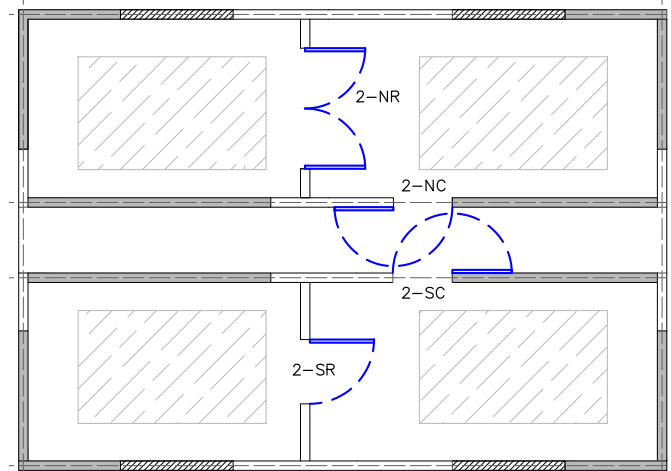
Plan layout of the doors (level 2, typical of levels 3-6).
